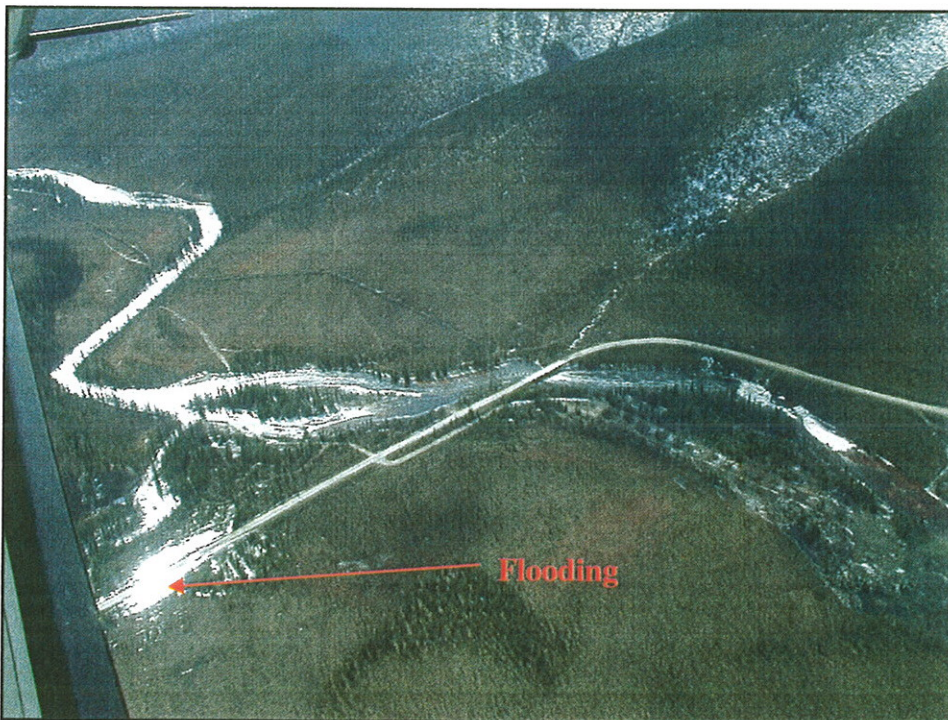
Aerial view of flooding along the Taylor Highway near the Walker Fork Campground. (4/30/03)
